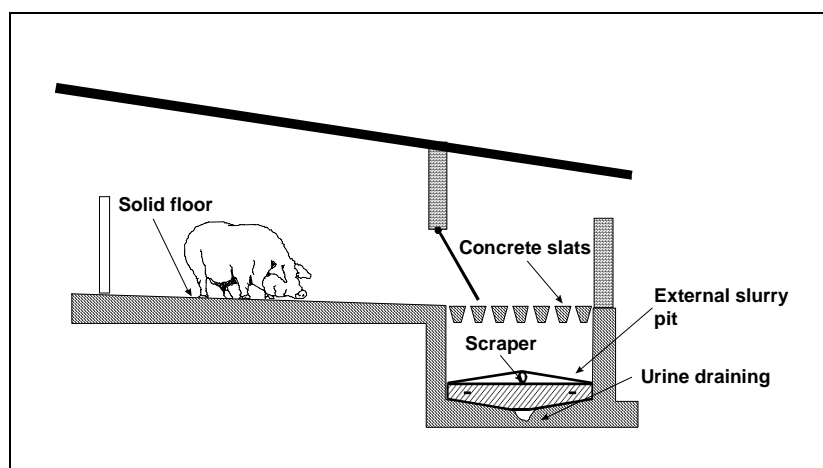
Solid concrete floor with slatted external alley and scraper underneath [59, Italy, 1999]
